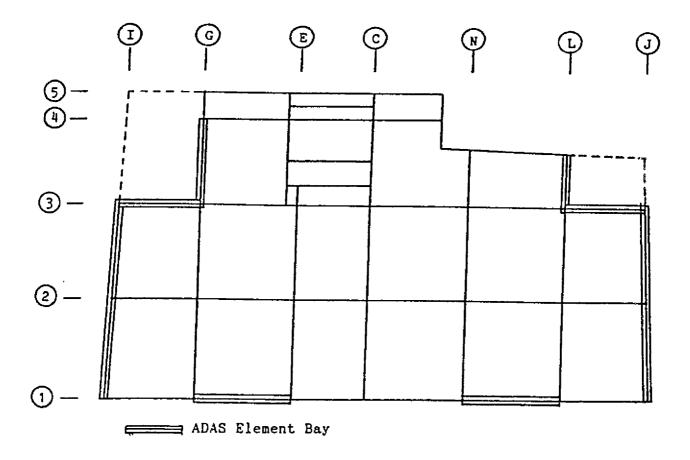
Schematic Plan Showing Locations of ADAS Bays in Izazaga #38-40 Building (Typical Floor Plan)
